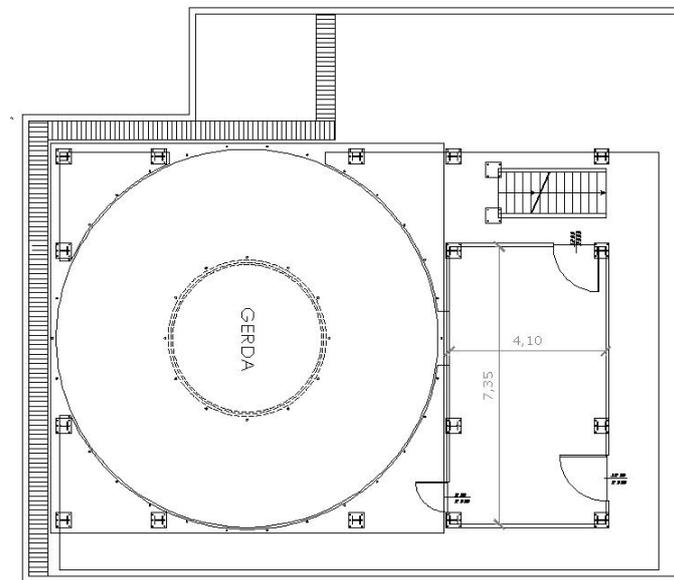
Plan of water vessel and laboratory building: ground and first floor
